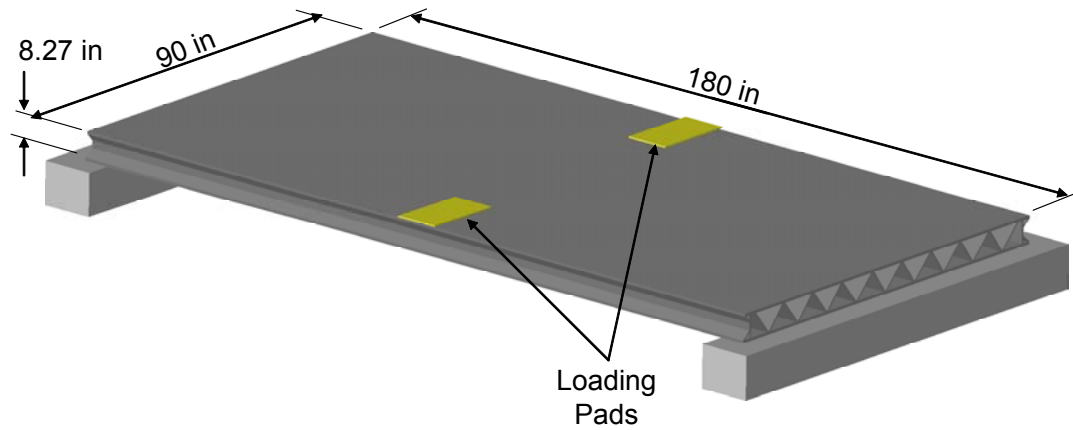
Static Loading Configuration for Composite Bridge Deck HD
